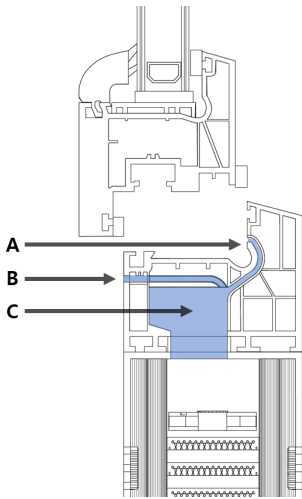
Cross-section and Outlet Detail of Air Glide Window
